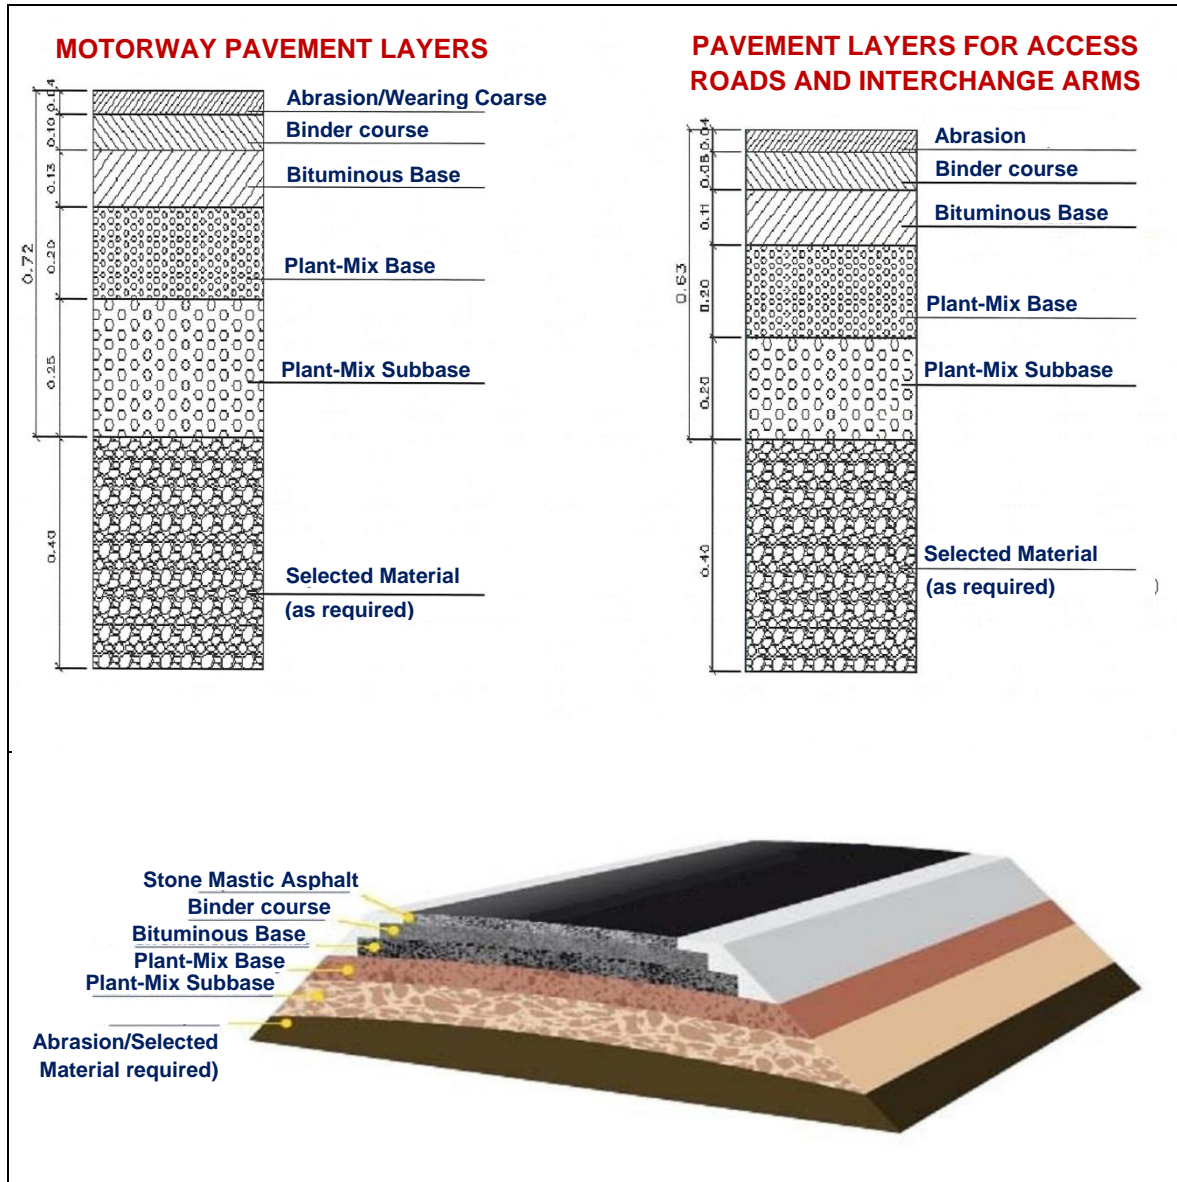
Road Pavement for the Motorway and Access Roads (Source: KGM, August 2010)
